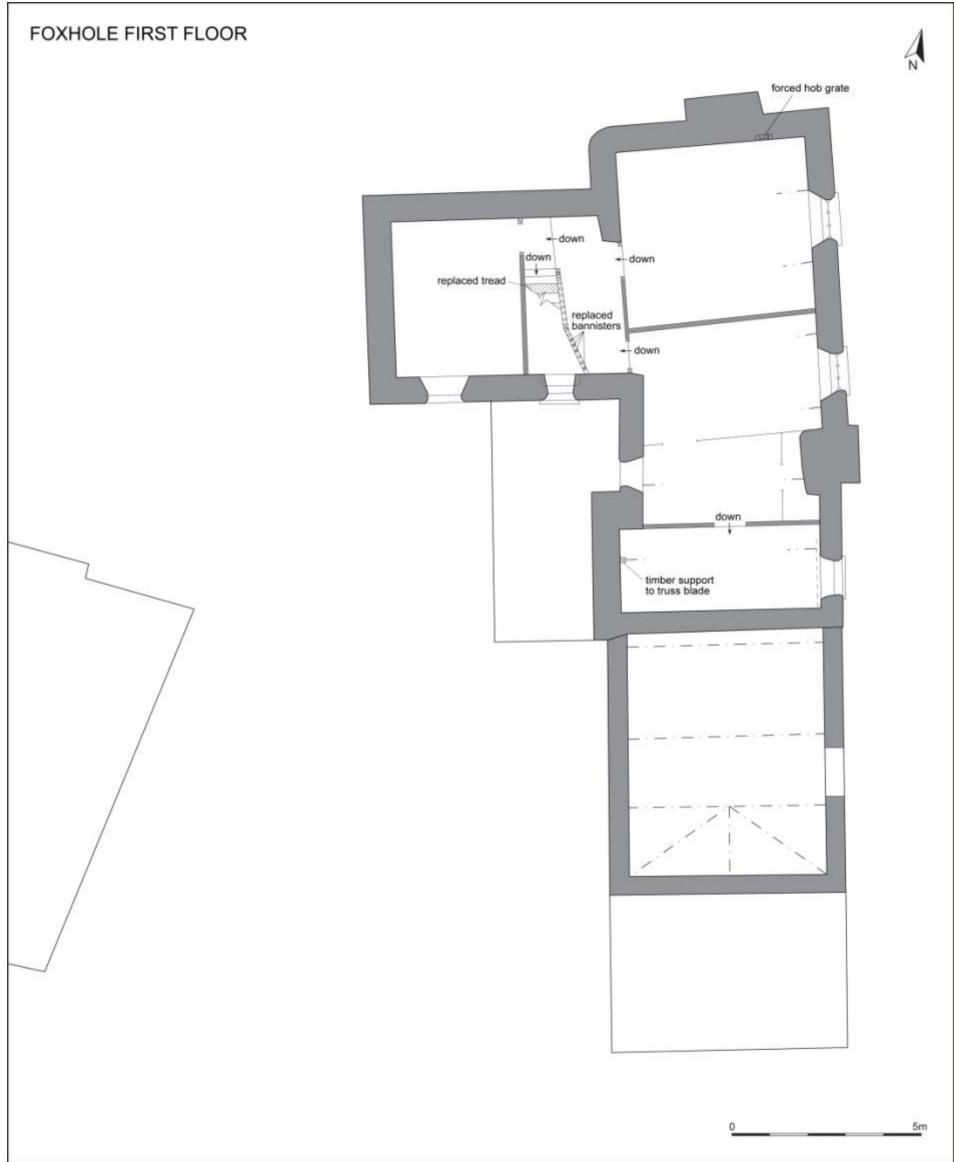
ANNOTATED FIRST FLOOR PLANS OF THE HOUSE.
